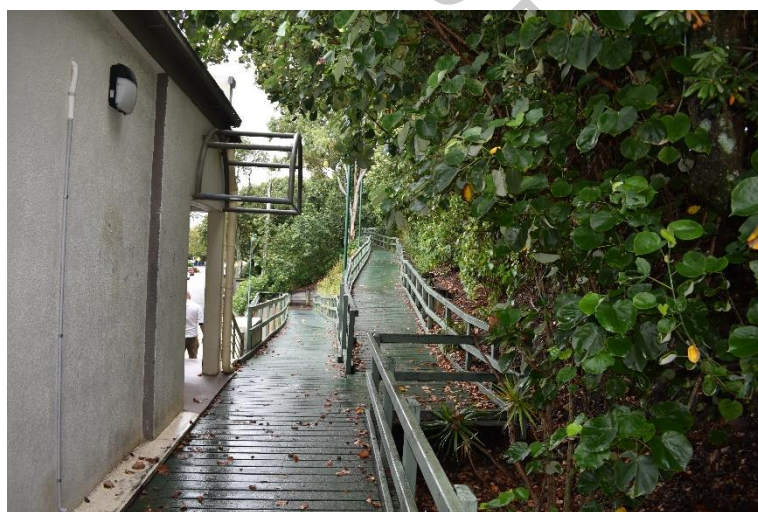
South-west corner showing modern extended rear wall and modern timber ramp
